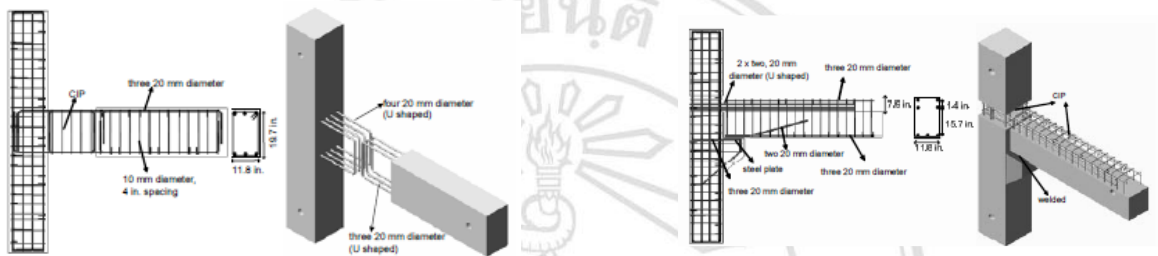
Typical connection detail (Li *et al.*, 2009)
